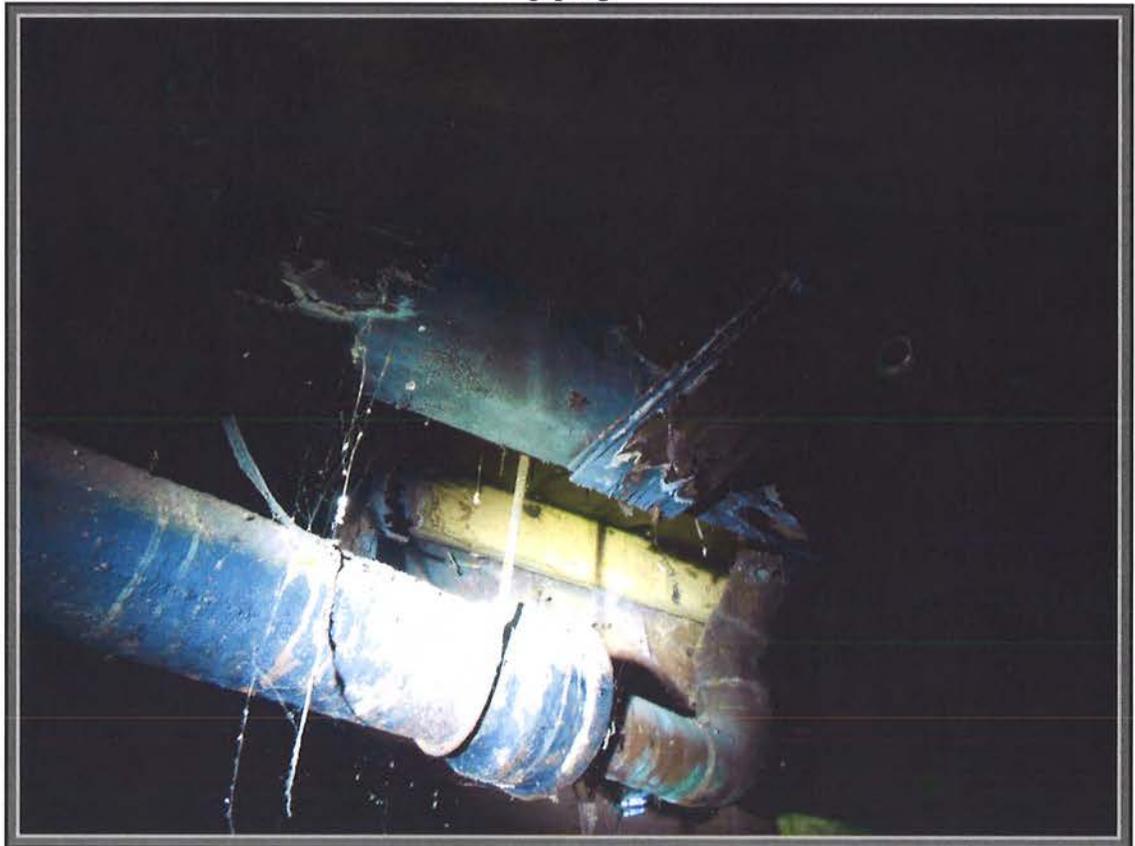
shows an inappropriately cut joist weakening its structural integrity and a removed copper pipe leaving the building drainage system open allowing for the entry of sewer gases making for unsanitary conditions.
